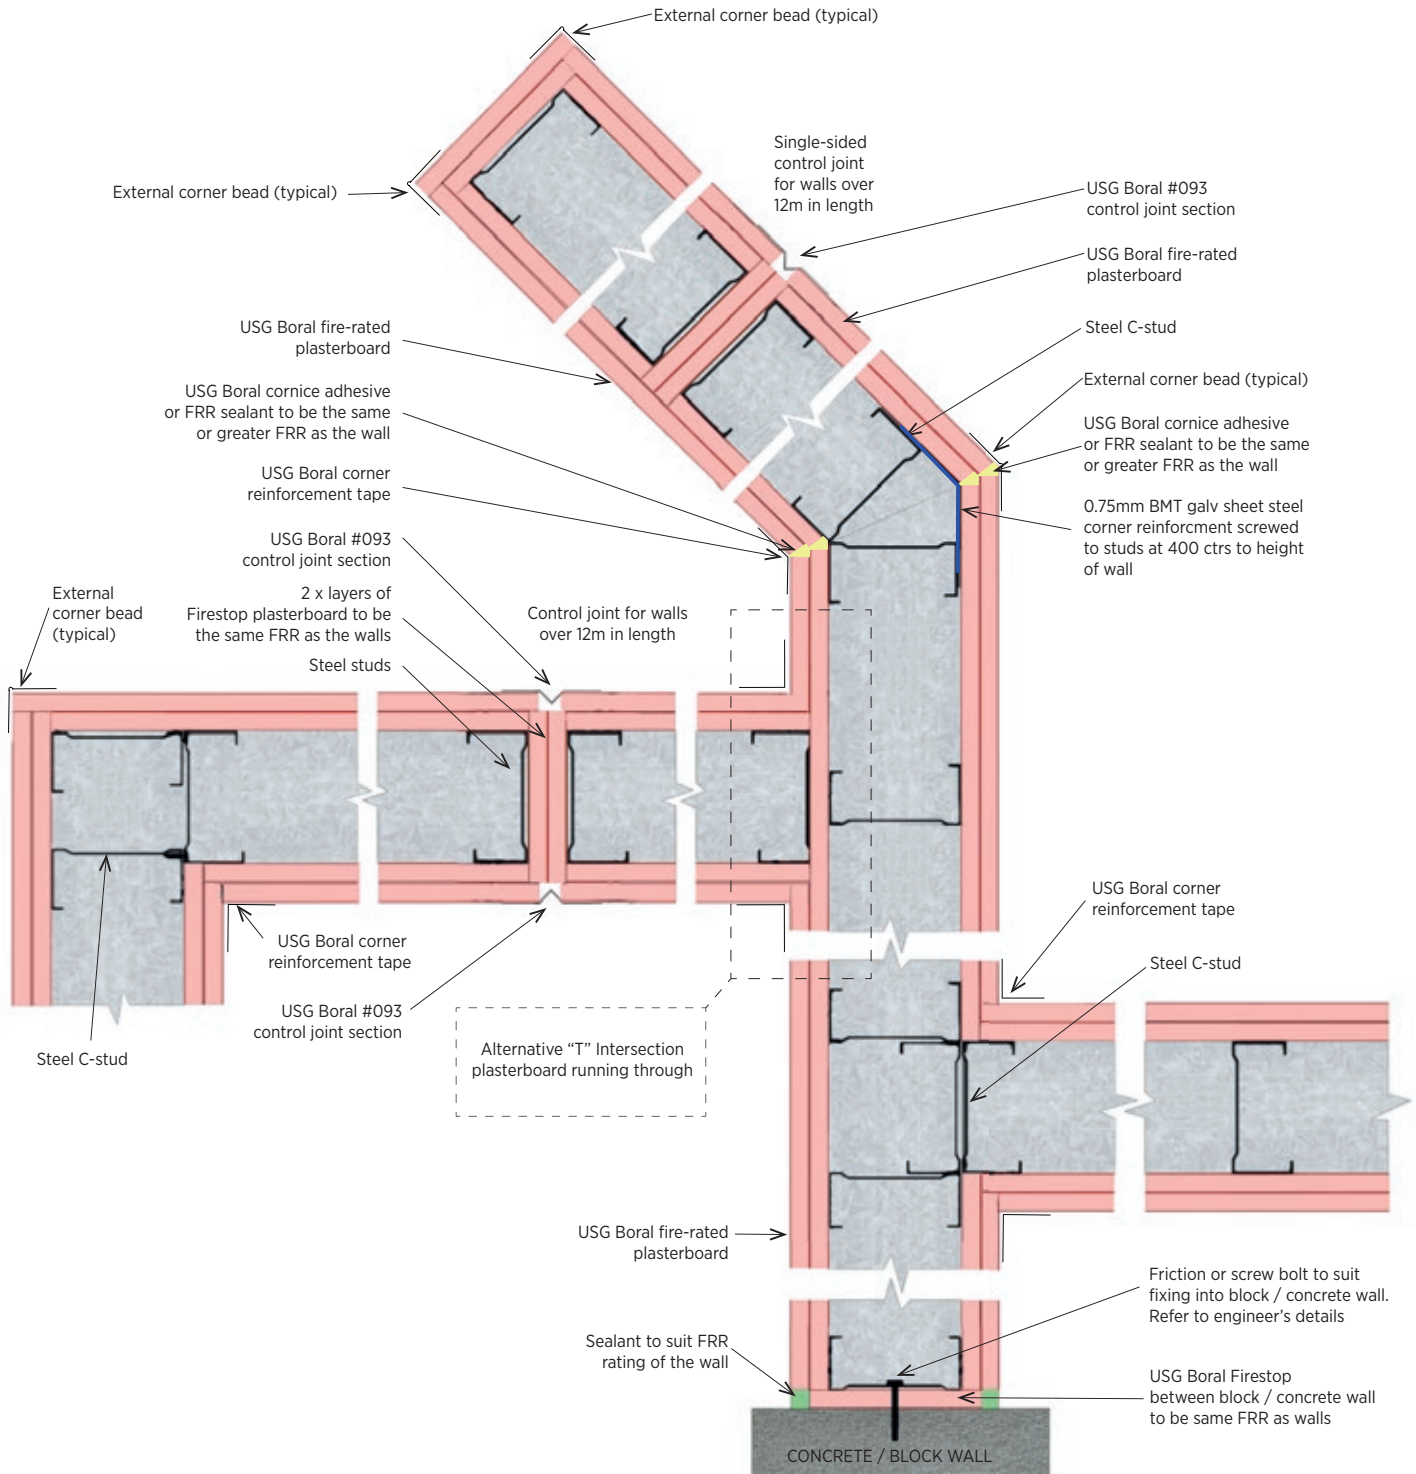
Single Stud Terminal Control Joint and Junctions Details 2x layers Fire-rated Plasterboard (Twin Stud & Staggered Stud layout similar)
